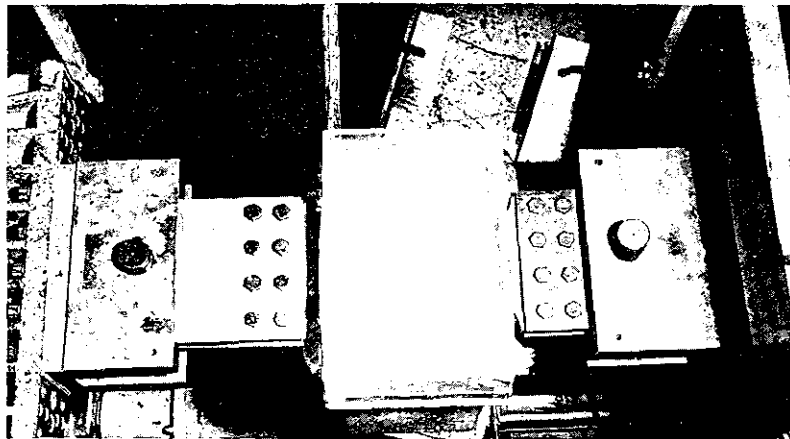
3/4 Surface-Crack Specimen Installed in Environmental Chamber with Salt Water Spray Operating
